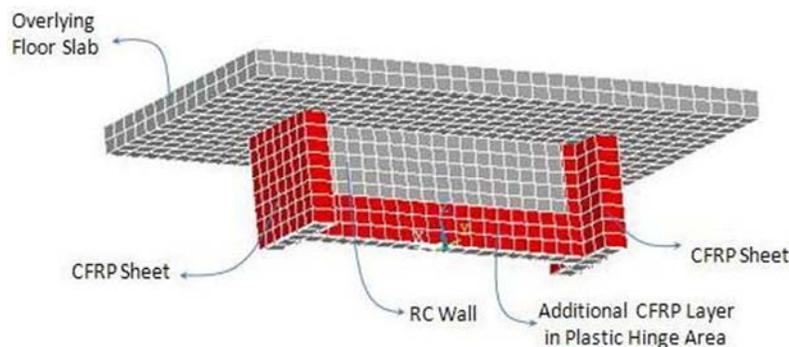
Finite Element model of strengthened wall by externally bonded CFRP sheets in boundary elements and plastic hinge area of the wall
